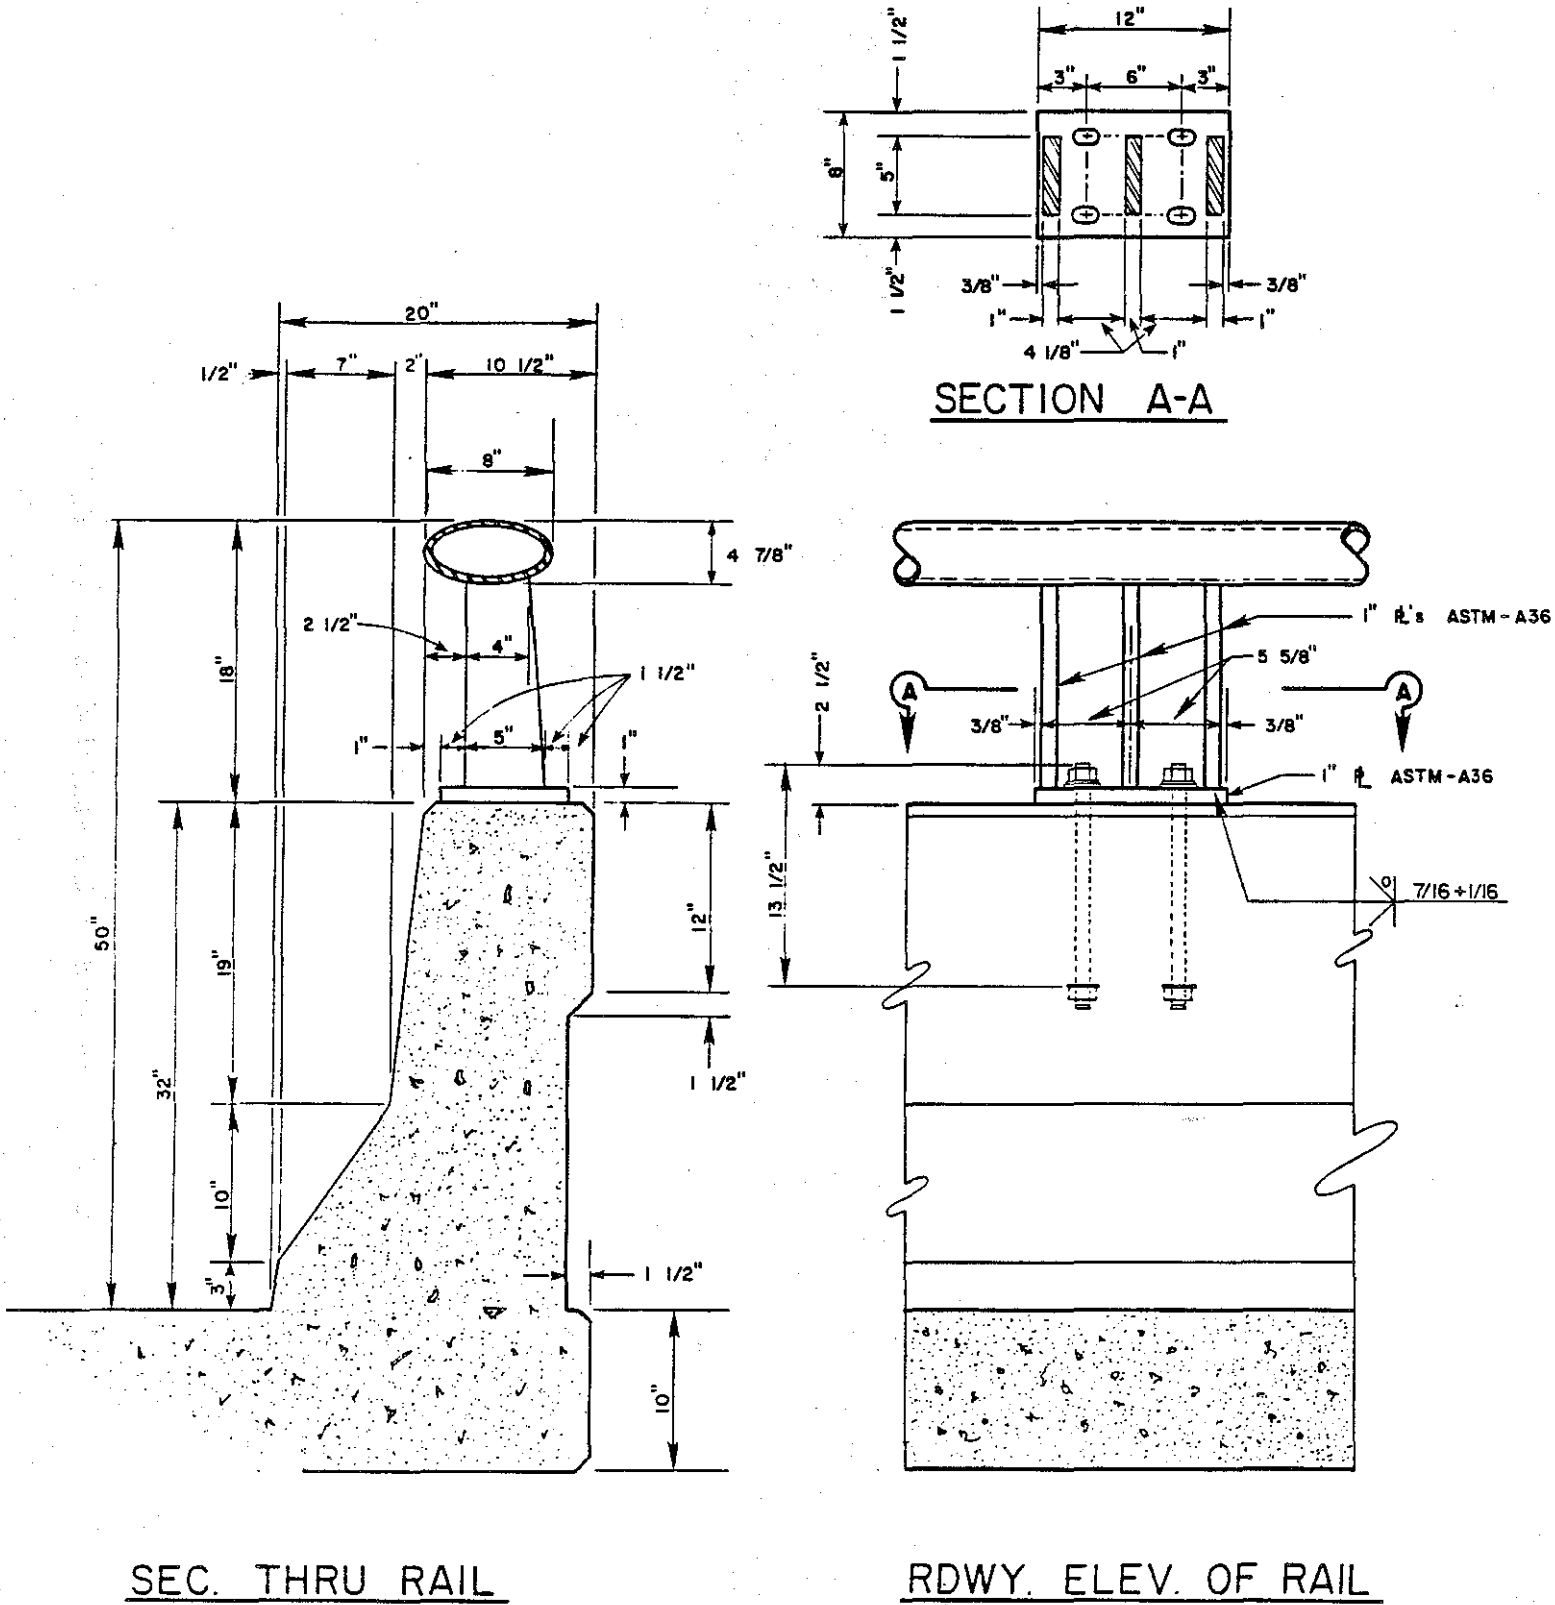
Dimensions and Elevation of the Modified T5 Bridge Rail.
